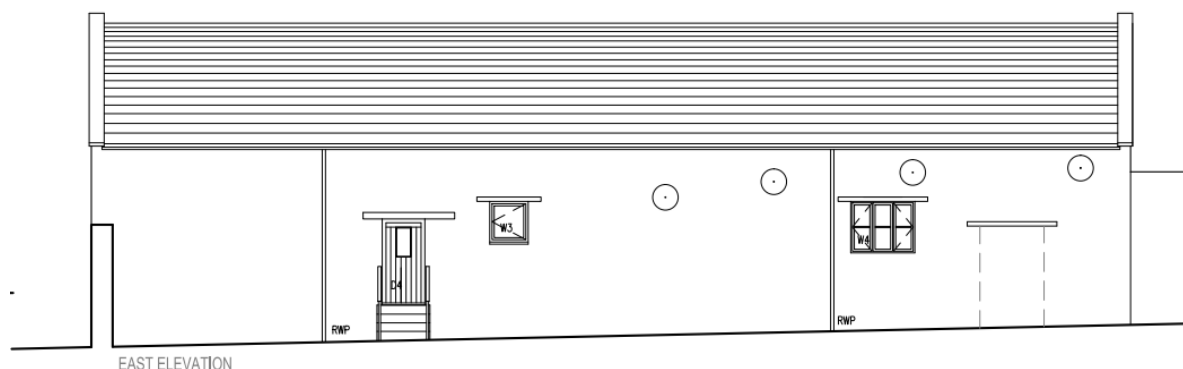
East elevation, as renovated. (Colin Moore Architect).
